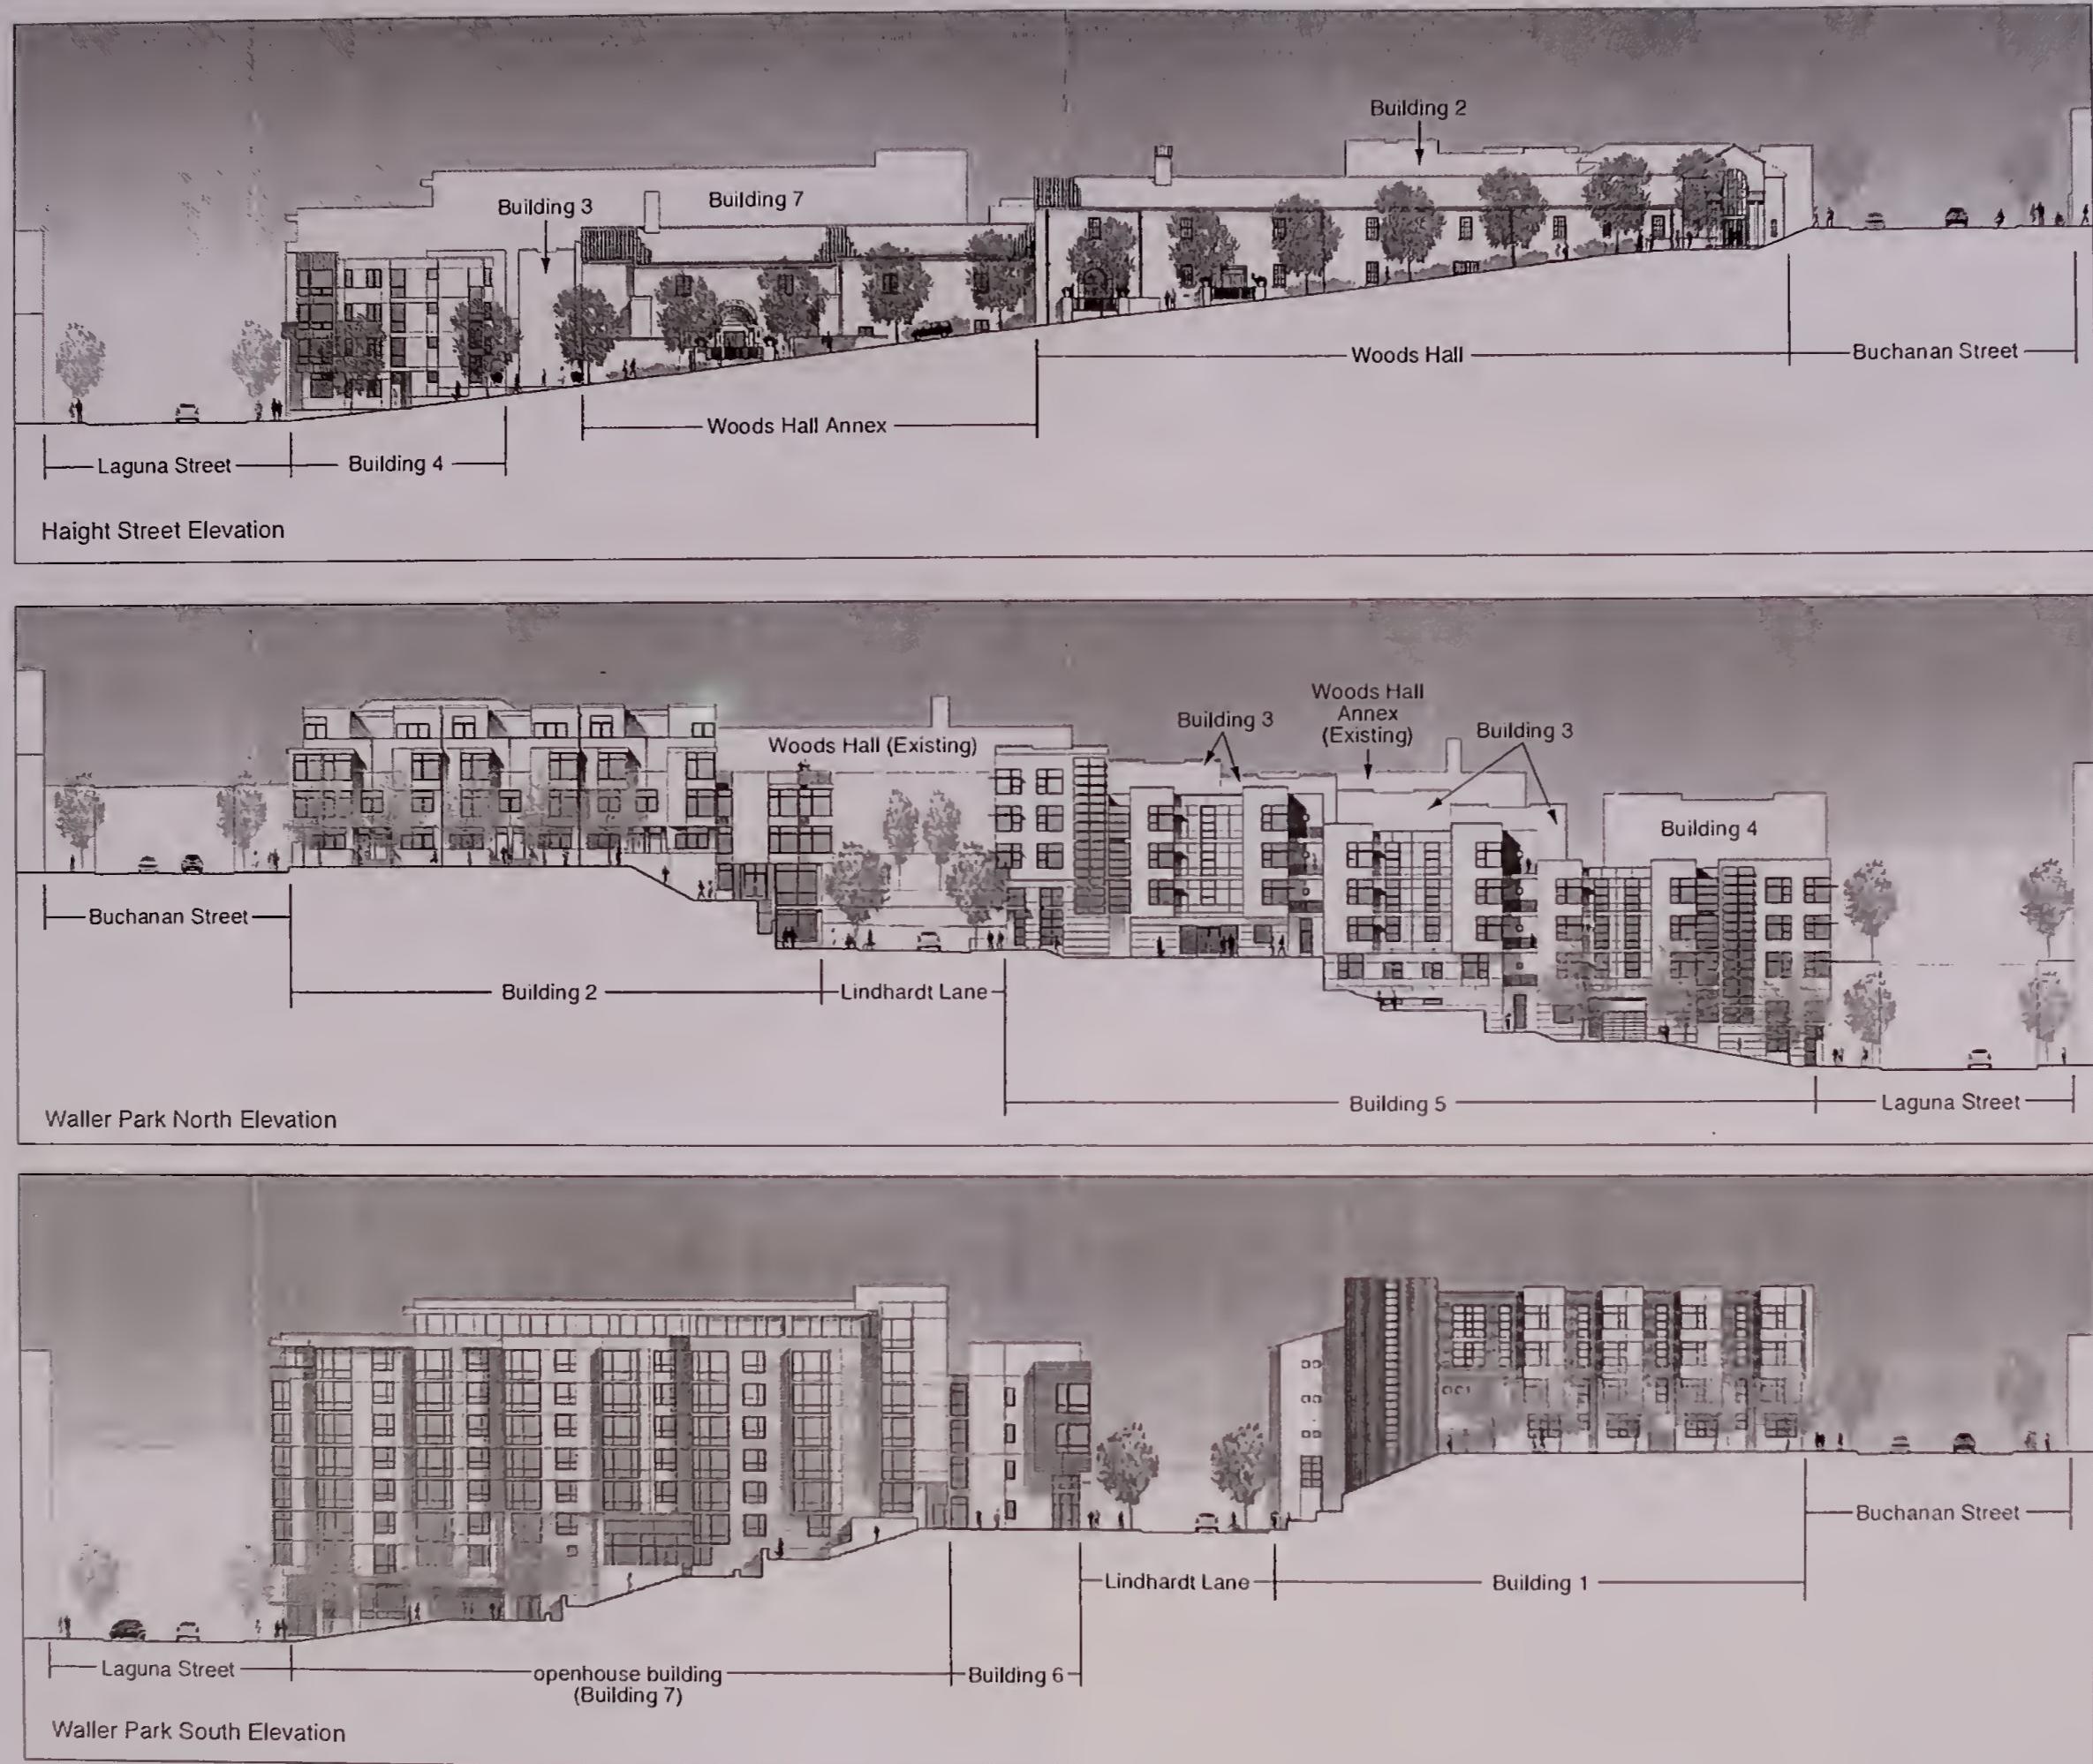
Haight Street Elevation and Waller Park North and South Elevations
